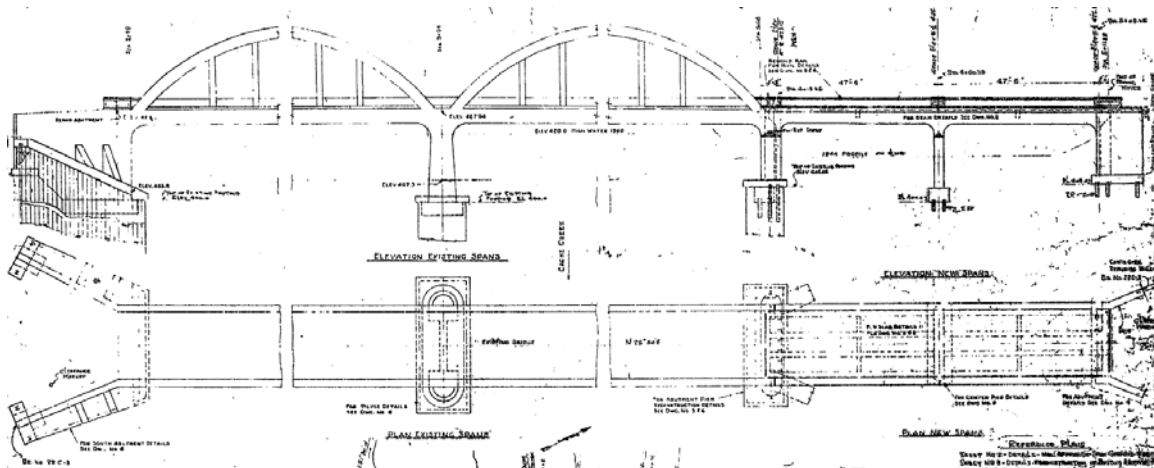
Bridge "as-built" plans showing original bridge on the south and lengthened bridge on the north
